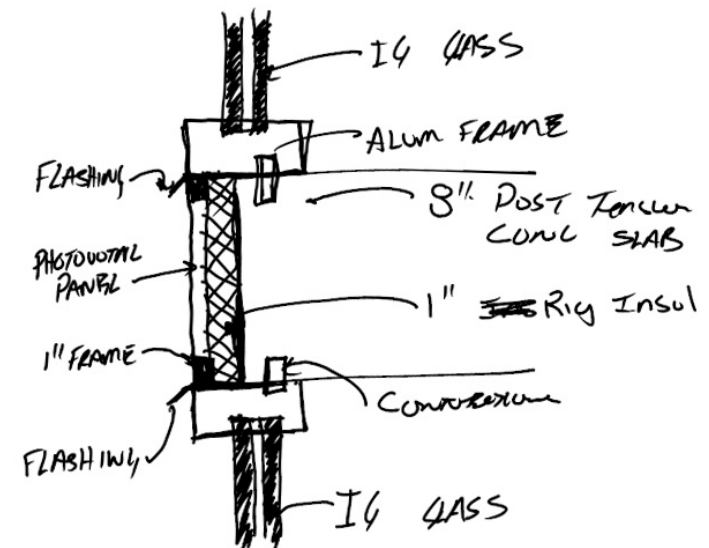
Photovoltaic Panel and Window Facade Detail
